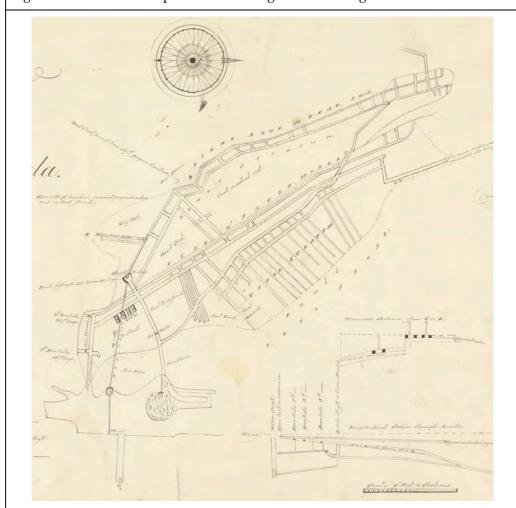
Detail of c.1837 plan of the underground workings at Coal Mines Station
